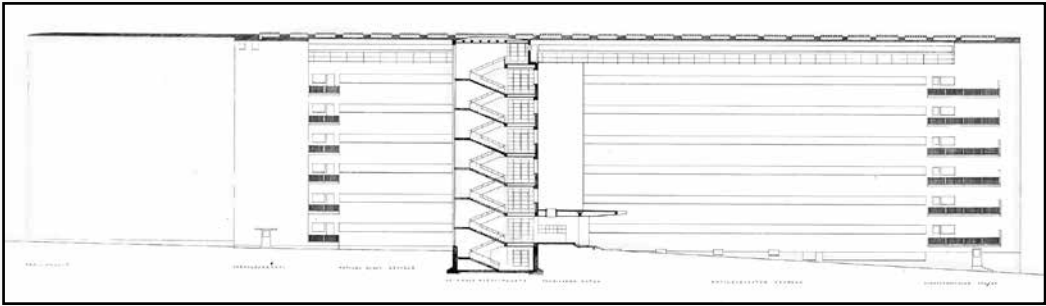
Master drawing of the north façade of A wing, April 1930. The north-facing elevation of the sundeck wing with its closed back wall on the left. Drawing No. 50-97a. The drawing has been edited. AAM.
